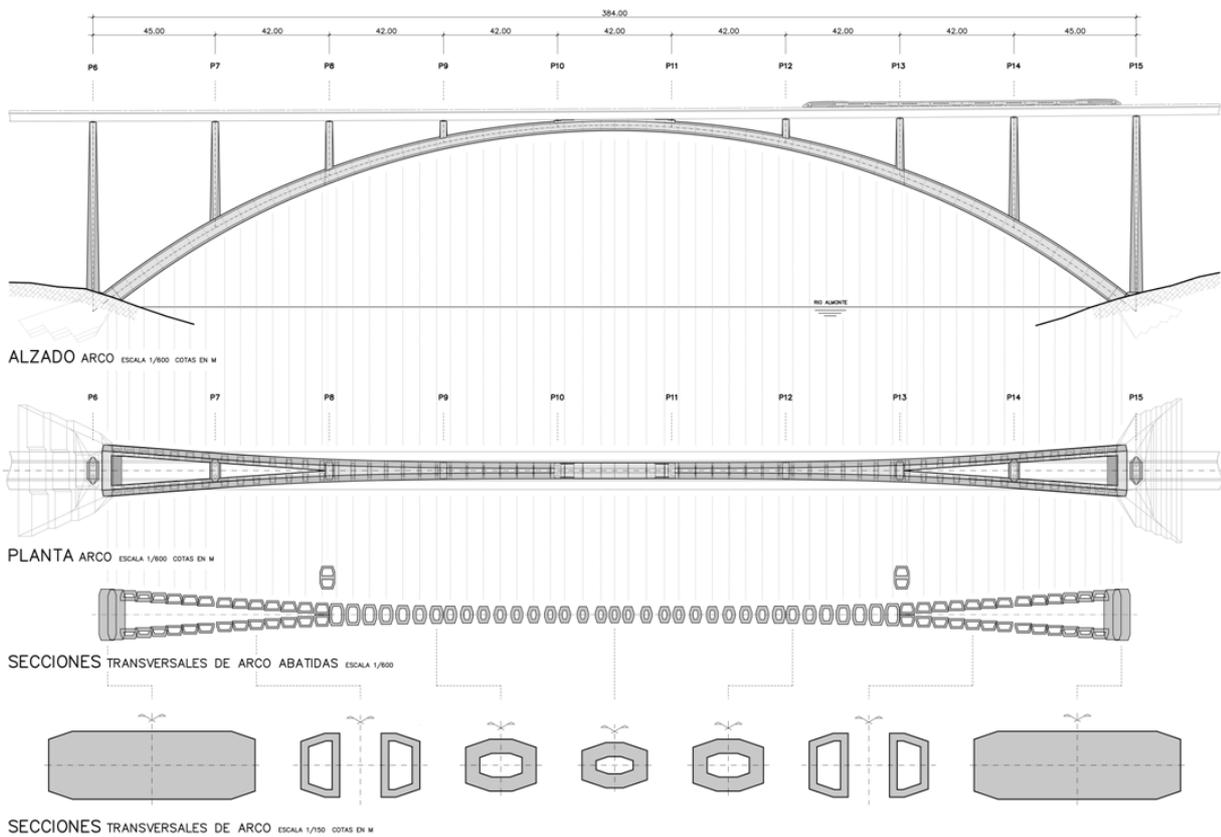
Geometric definition of the arch 01. Front elevation, plan view and cross sections
